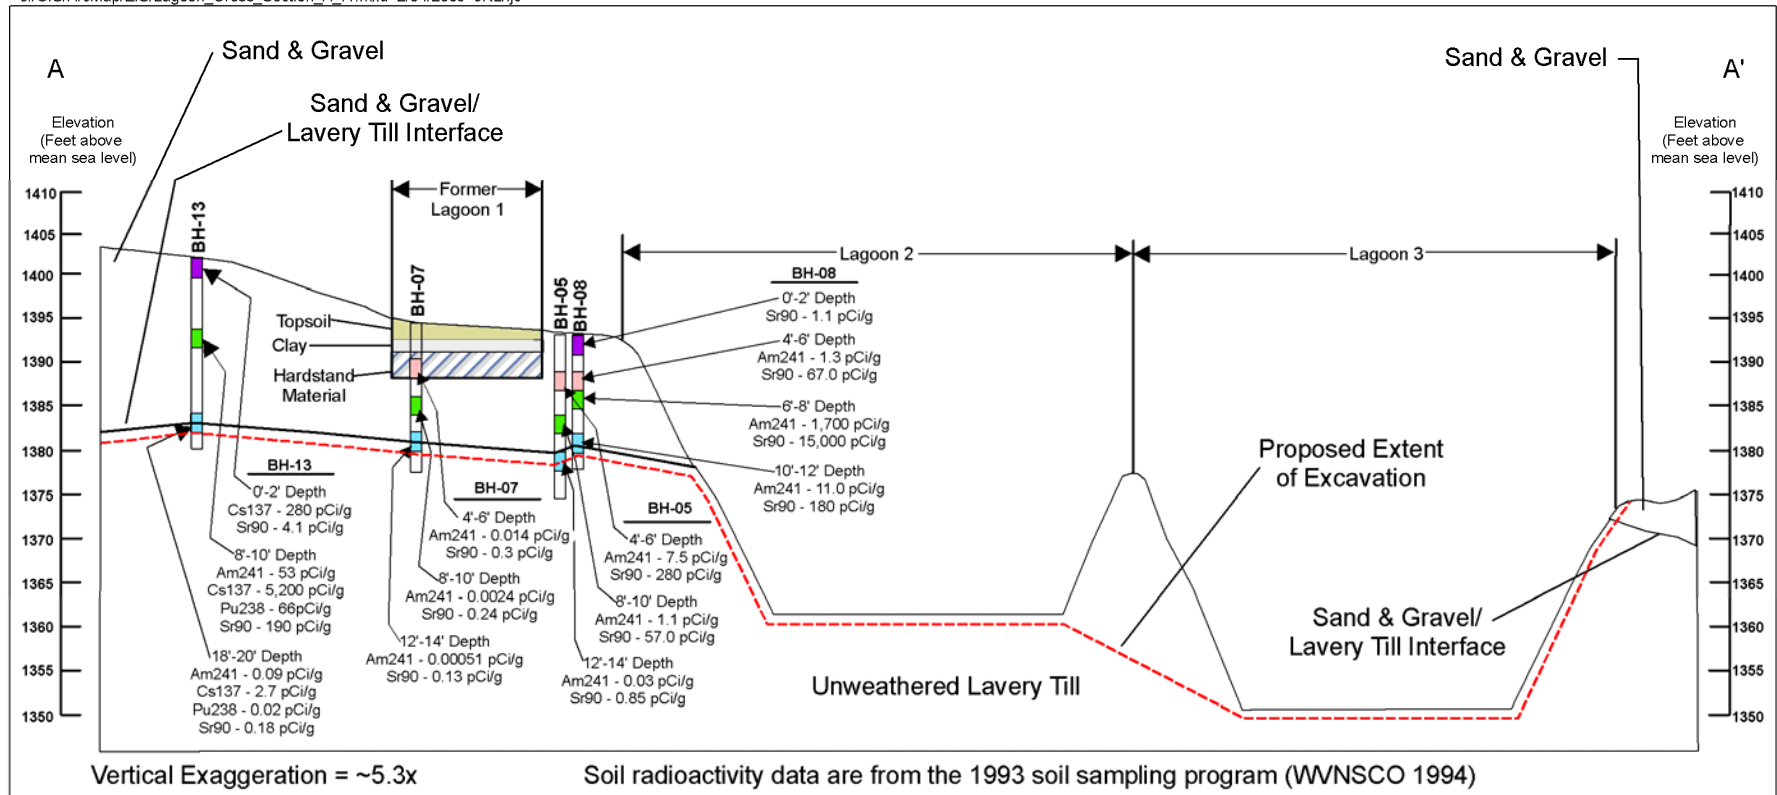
Conceptual Arrangement of WMA 2 Excavation, Cross Section
